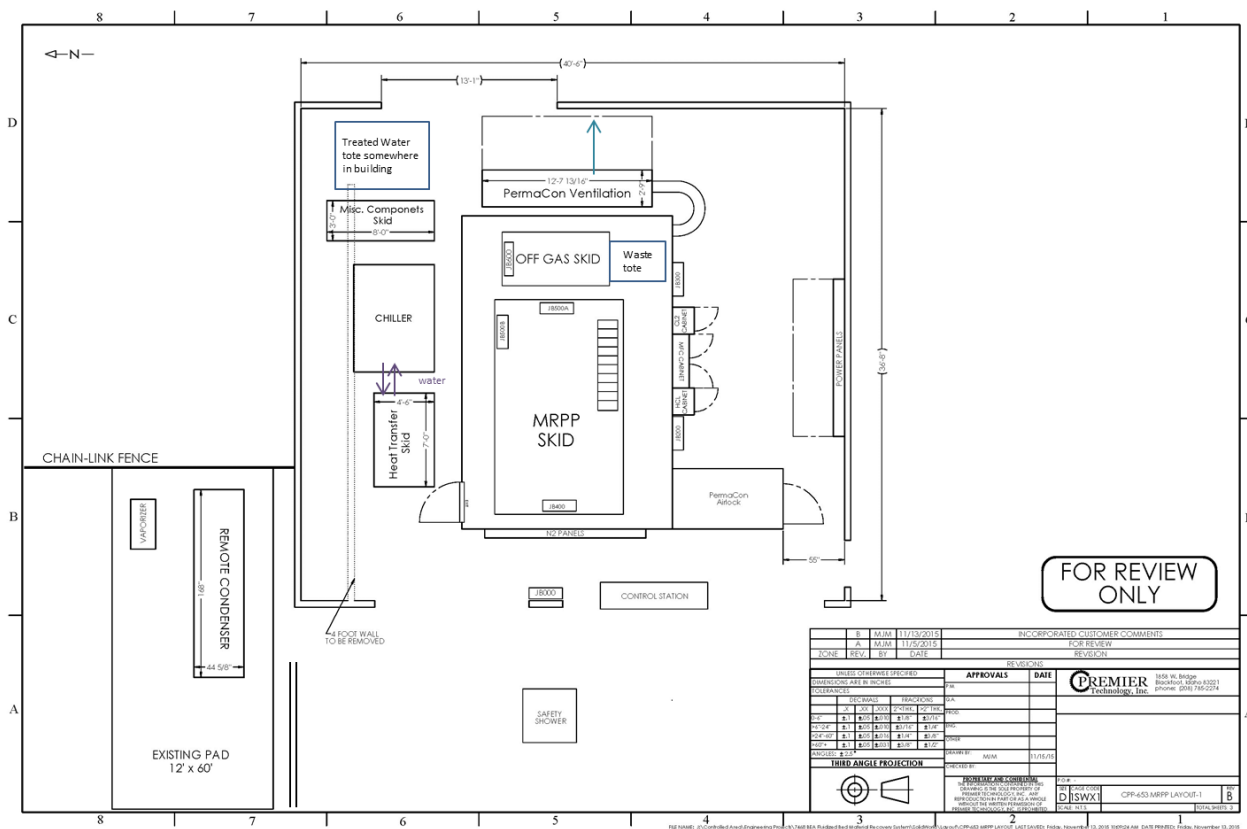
Layout of ZIRCEX pilot plant and supporting equipment at CPP-653.
